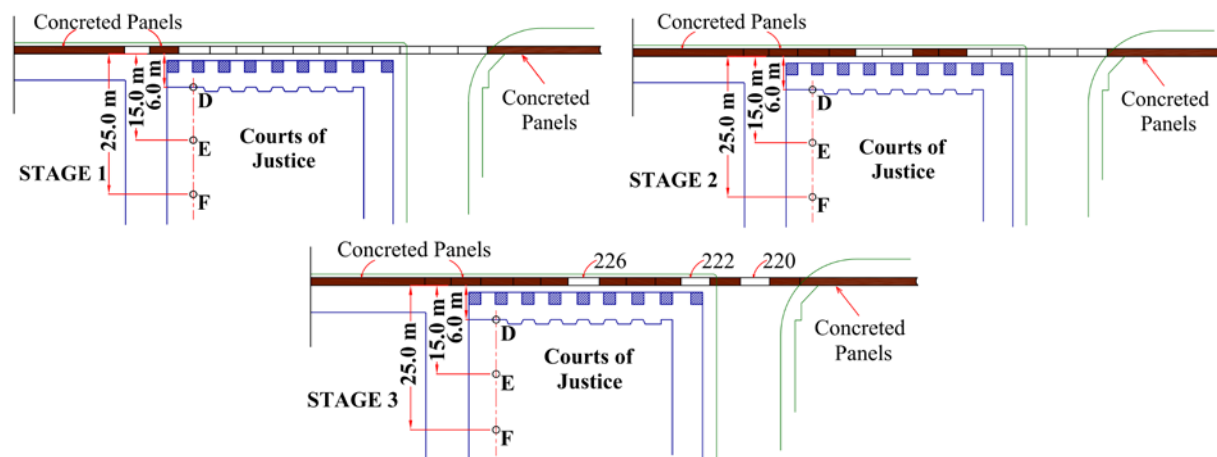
Diaphragm wall construction stages near Courts of Justice (Davies and Henkel, 1982)
